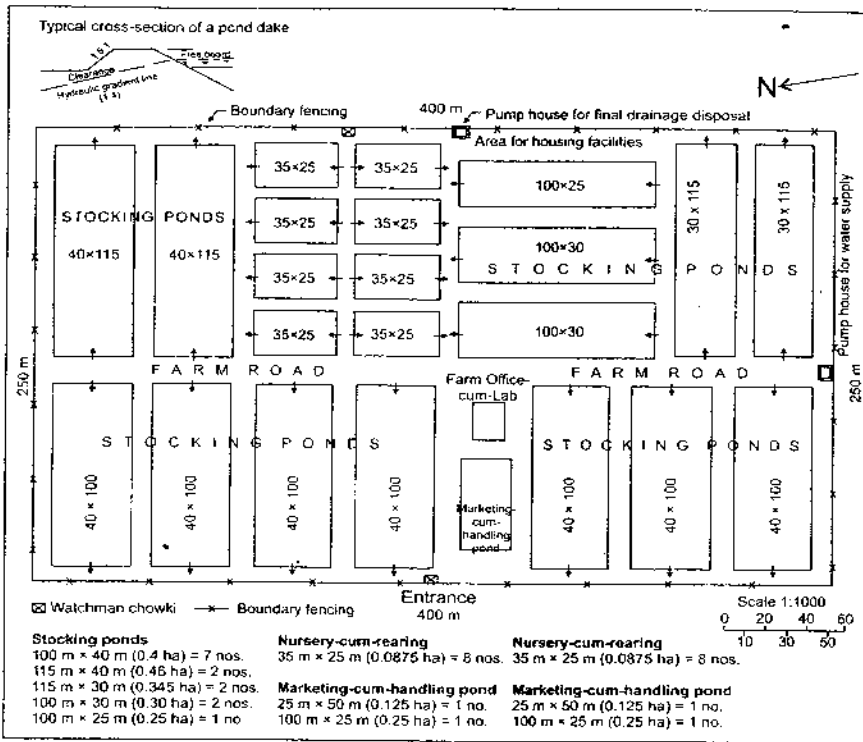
Typical layout of a 10-ha freshwater fish farm (plan at ground level).
